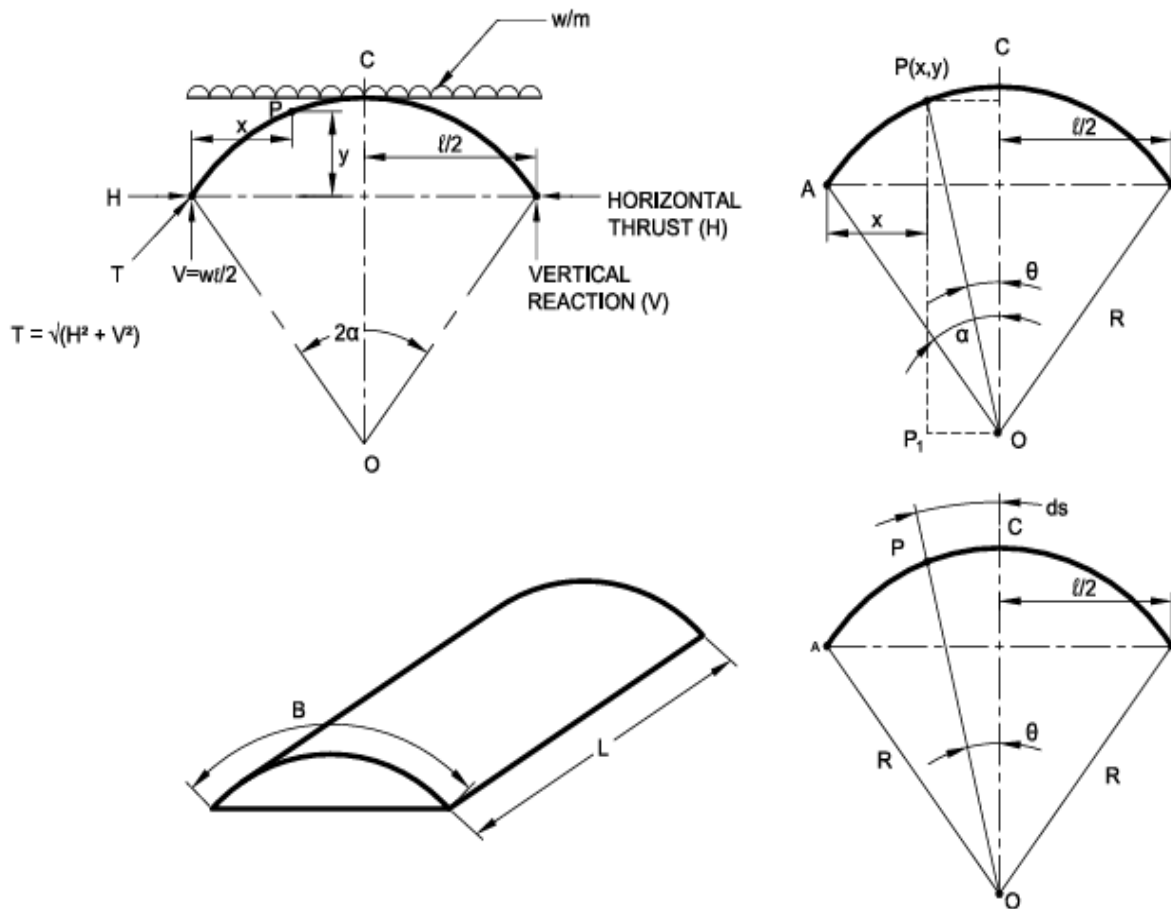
TYPICAL ARRANGEMENT OF LAMELLA ROOFING
